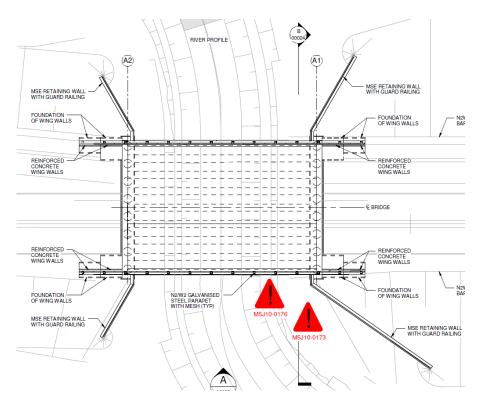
Plan of proposed square River Chelt bridge with straighter River Chelt
